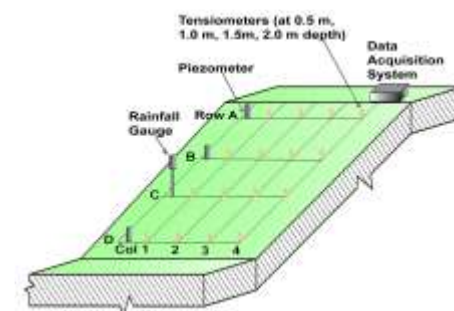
Schematic diagram of typical slope instrumentation in Singapore
